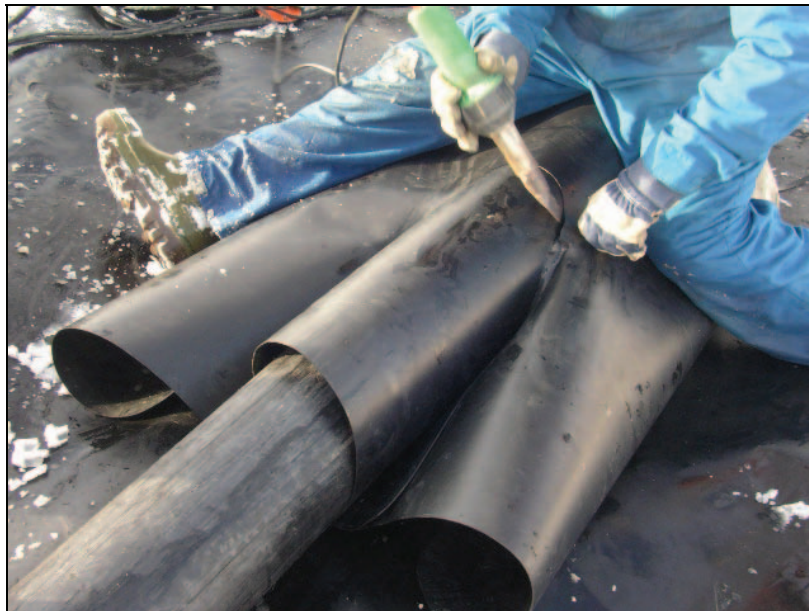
Placement of “skirt” around the LCRS riser pipe.
